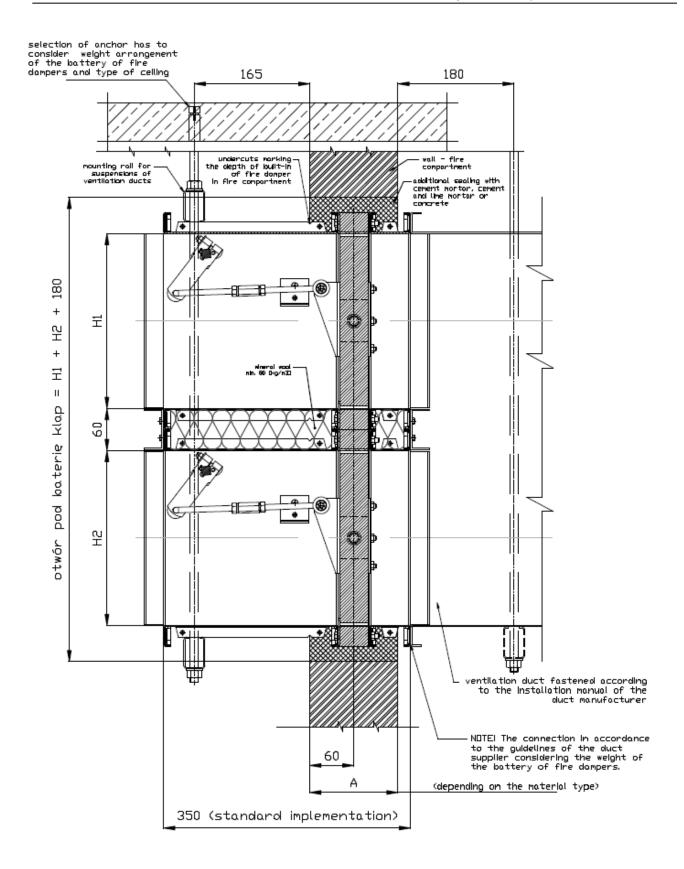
Installation of a battery consisting of two fire dampers KWP in vertical arrangement in rigid compartment – side view.
